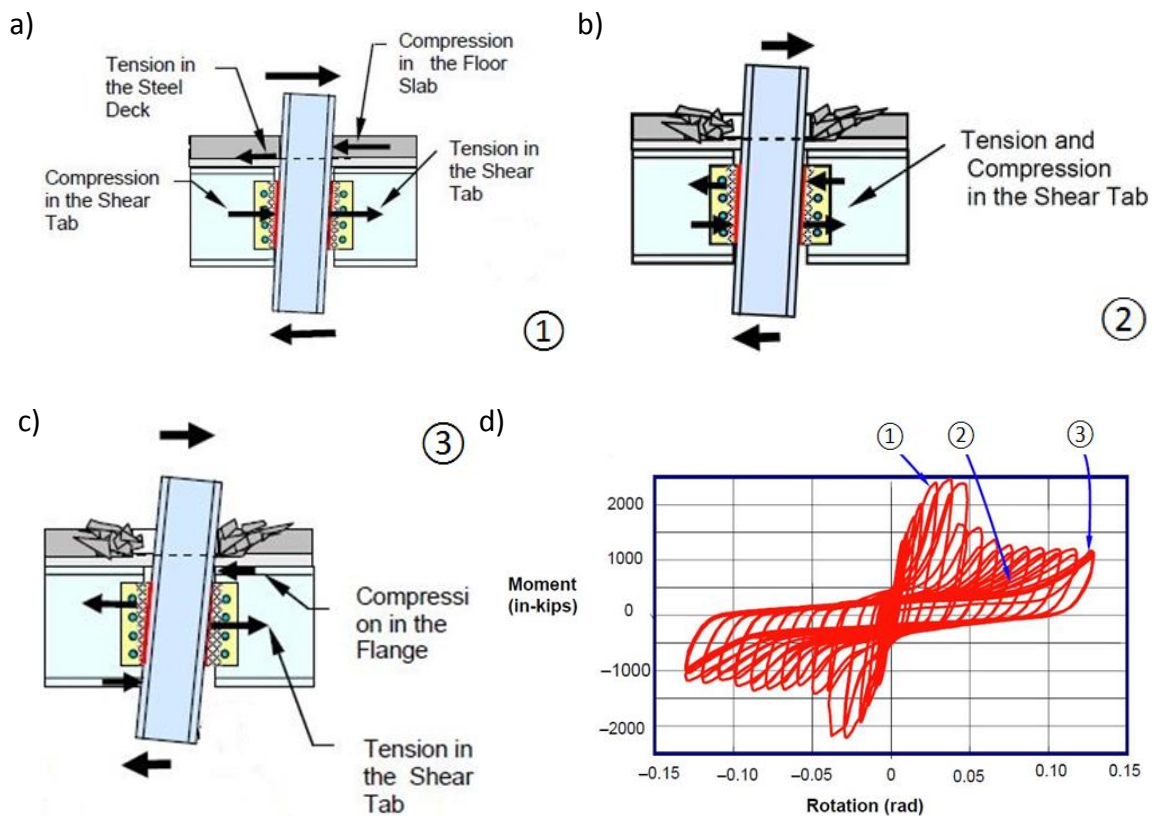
Beam-to-column connection behaviour: a) Compression of concrete slab; b) Concrete slab crashed and shear tab is resisting the moment; c) Beam is pressing against the column; d) Moment-rotation hysteresis loops (Liu and Astaneh-Asl, 2004)
